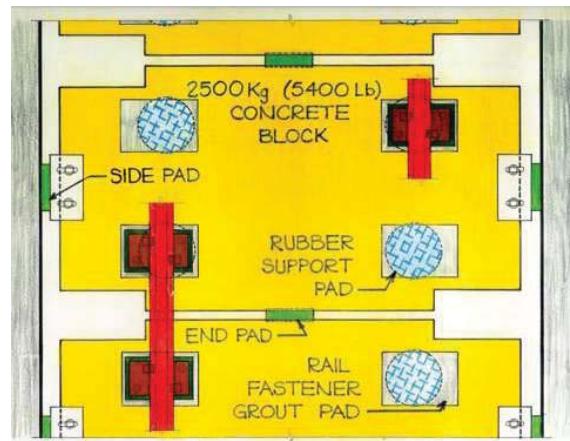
TTC double-tie discontinuous floating slab design - 1500 mm length precast concrete blocks
